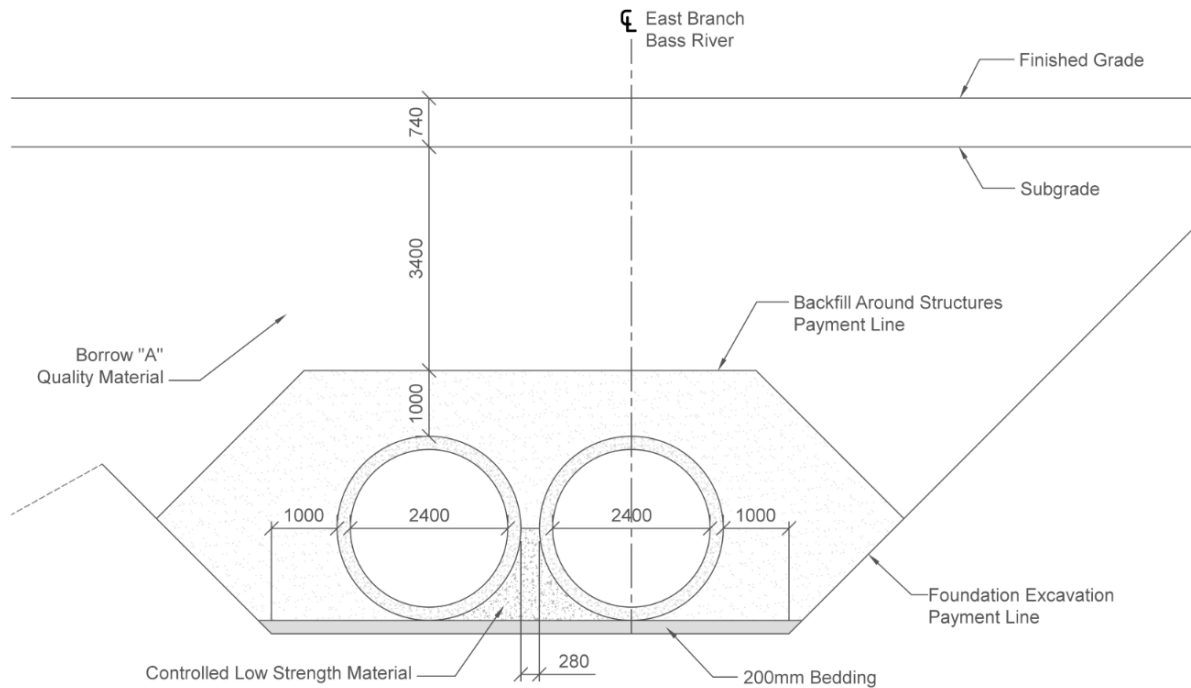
Design details of East Branch Bass River Culvert No. 1 (based on NBDTI 2013).
